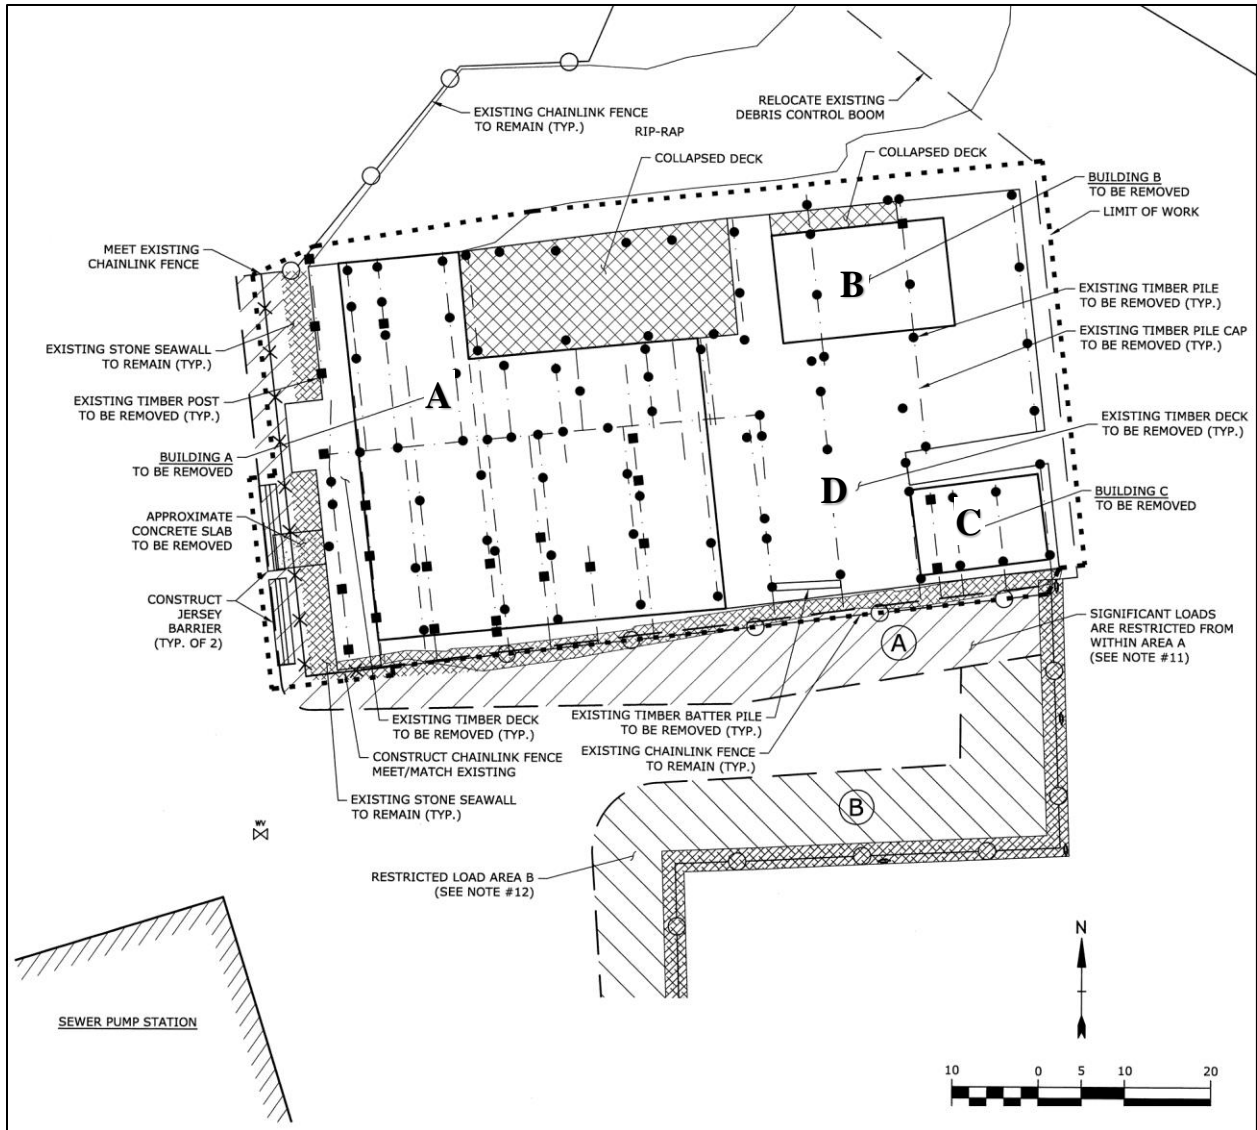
LaCava's Wharf project Demolition Plan showing Buildings A, B and C, wharf deck structure (D) and location and type of timber piling and posts supporting deck structure (Source: City of Portsmouth Public Works; plan prepared for City by Tighe & Bond Engineers, Portsmouth, NH).
